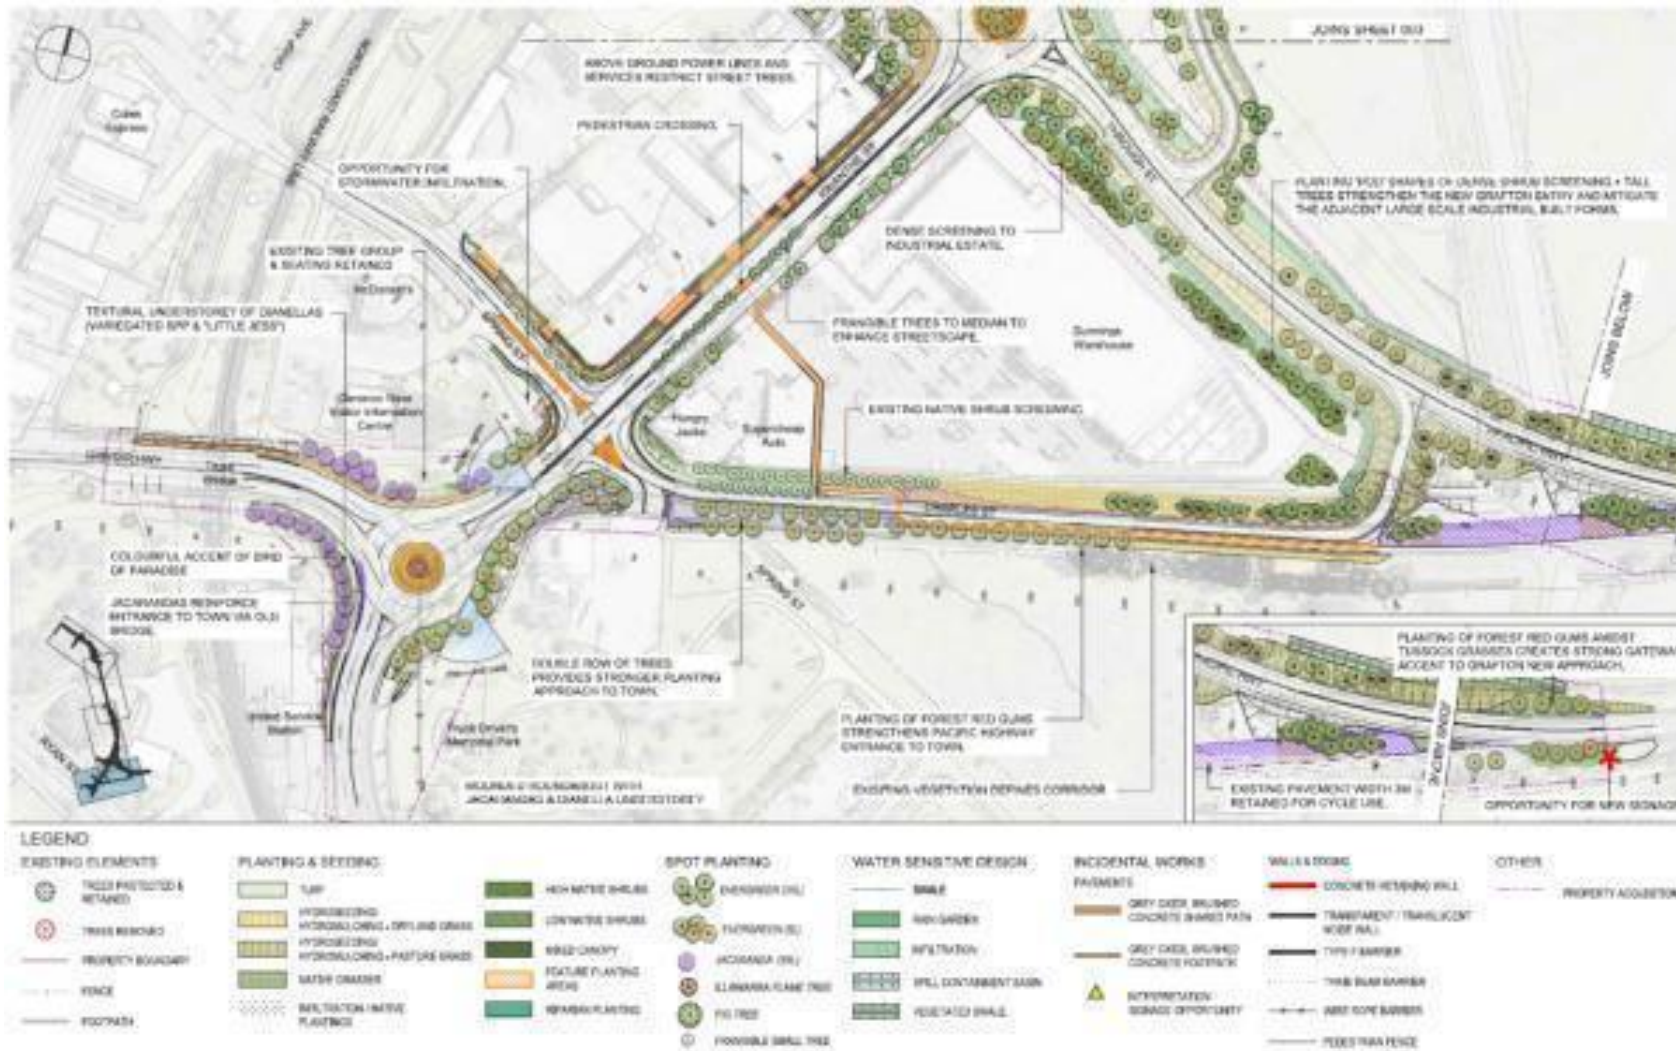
Urban and Landscape Design Plan (Street 5) - Asenby Street Parallel Highway Design Project (Scale: 1:2000)
